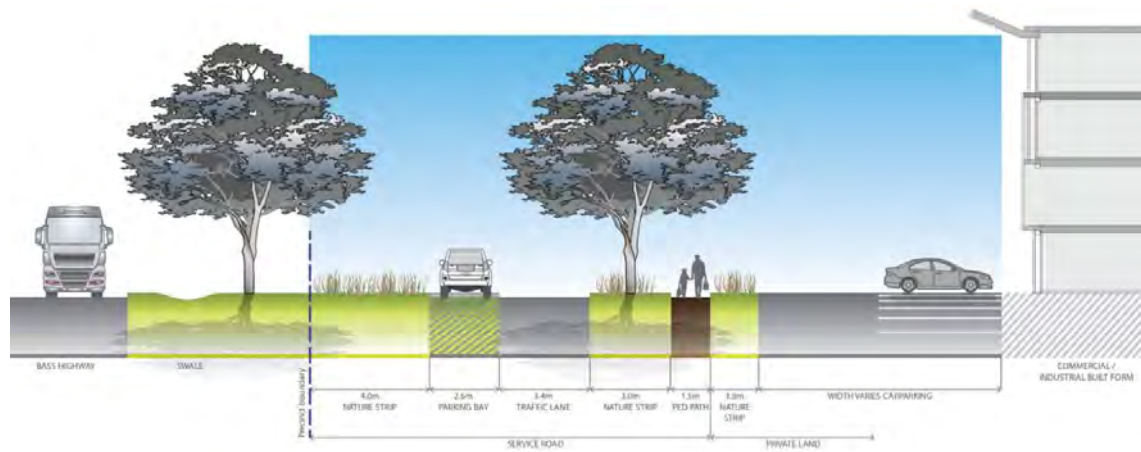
Indicative Cross-Section - CS1 Connector Street Boulevard (28.0-31.0m)
